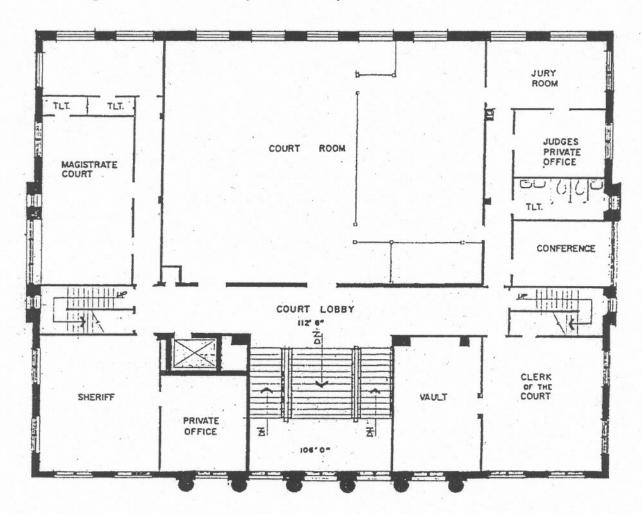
Late 19th-Early 20th Century Courthouse Plan-First Floor
